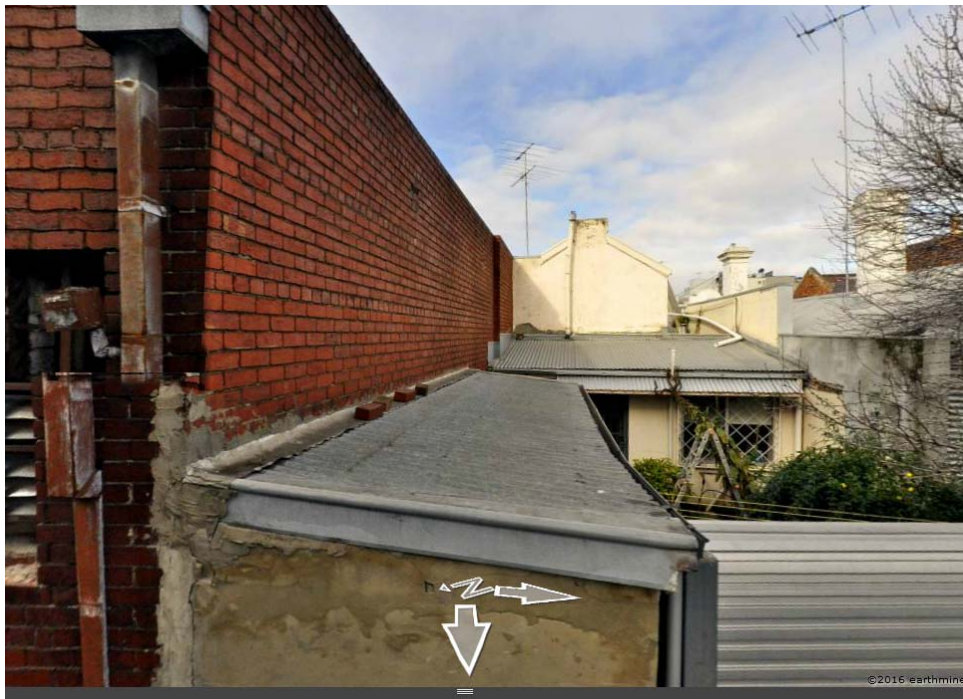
Rear of the neighbouring property at 110 Hawke Street including the shared boundary wall on the subject site.
